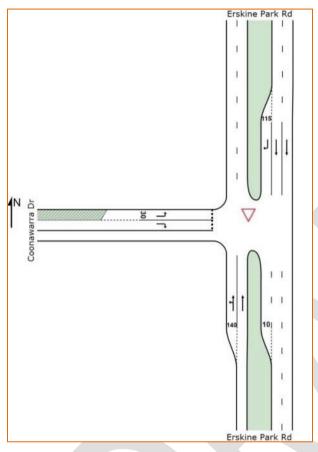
Existing Intersection Layouts assumed in the SIDRA models
